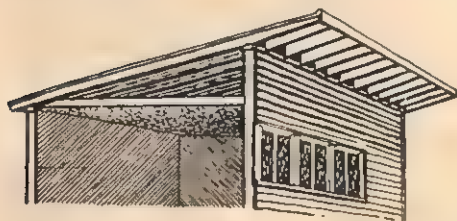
A new type of roof. By carrying the rafters well out, rain is kept from the windows. Over-shading is lessened by keeping the roof up from the windows. On a low-pitched roof such as this, tiles are not suitable, so copper or zinc sheeting is used instead.
